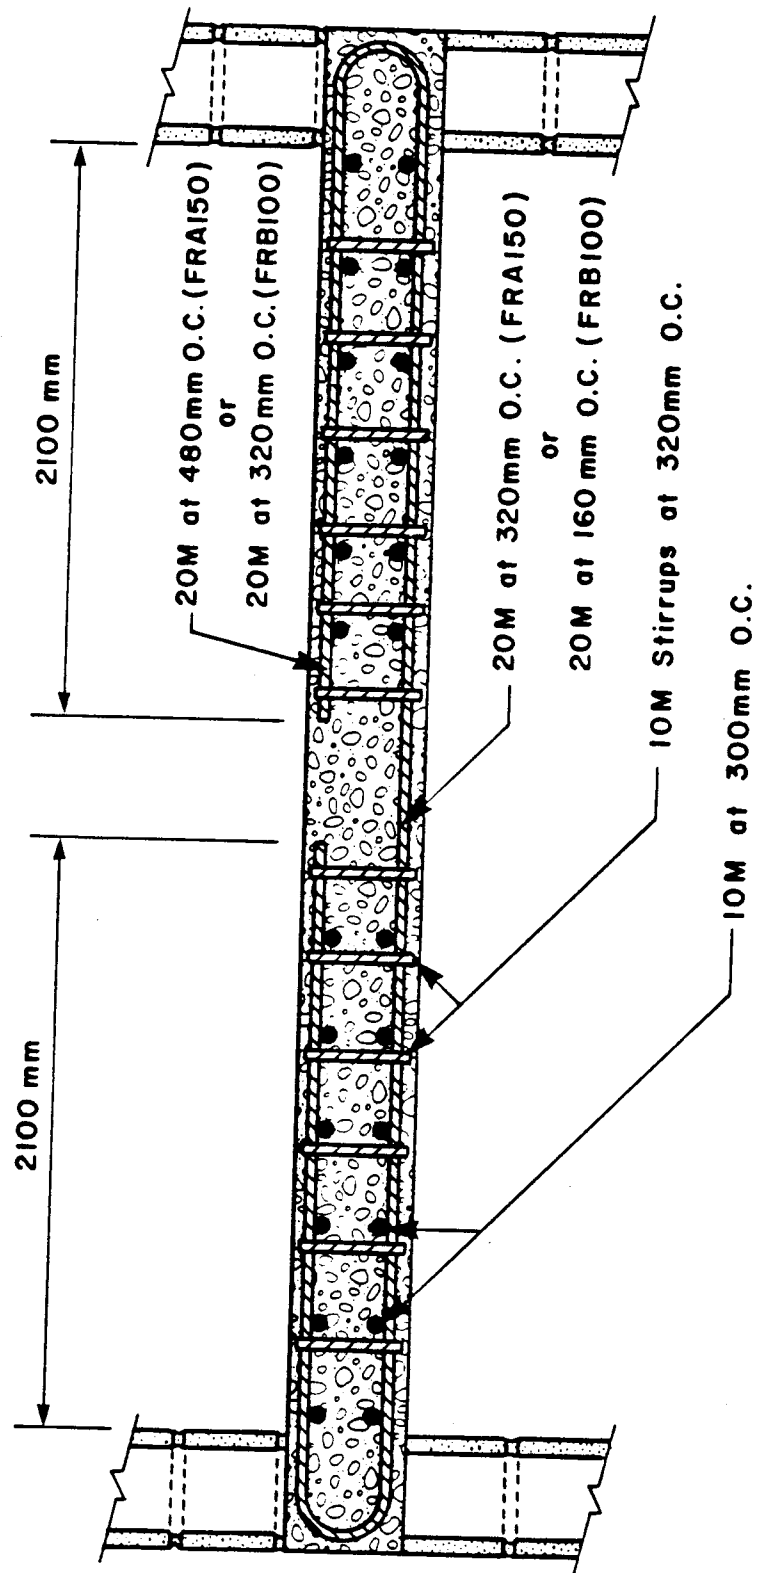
Slab Reinforcement Details for Type II Specimens
